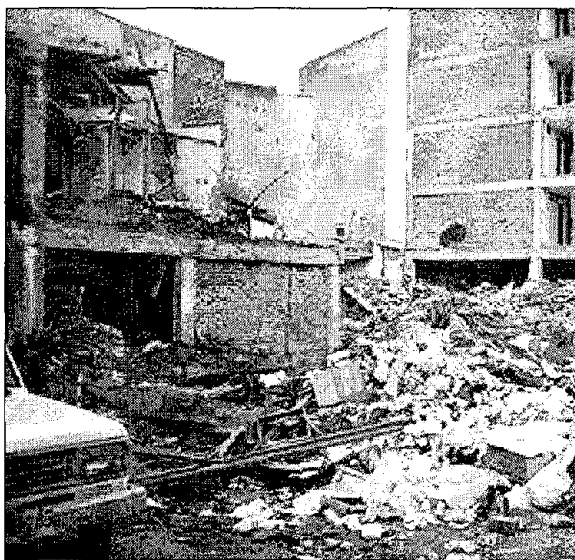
City of Pereira: Carrera 12/Calle 22, 3-Story Building, Collapsed
